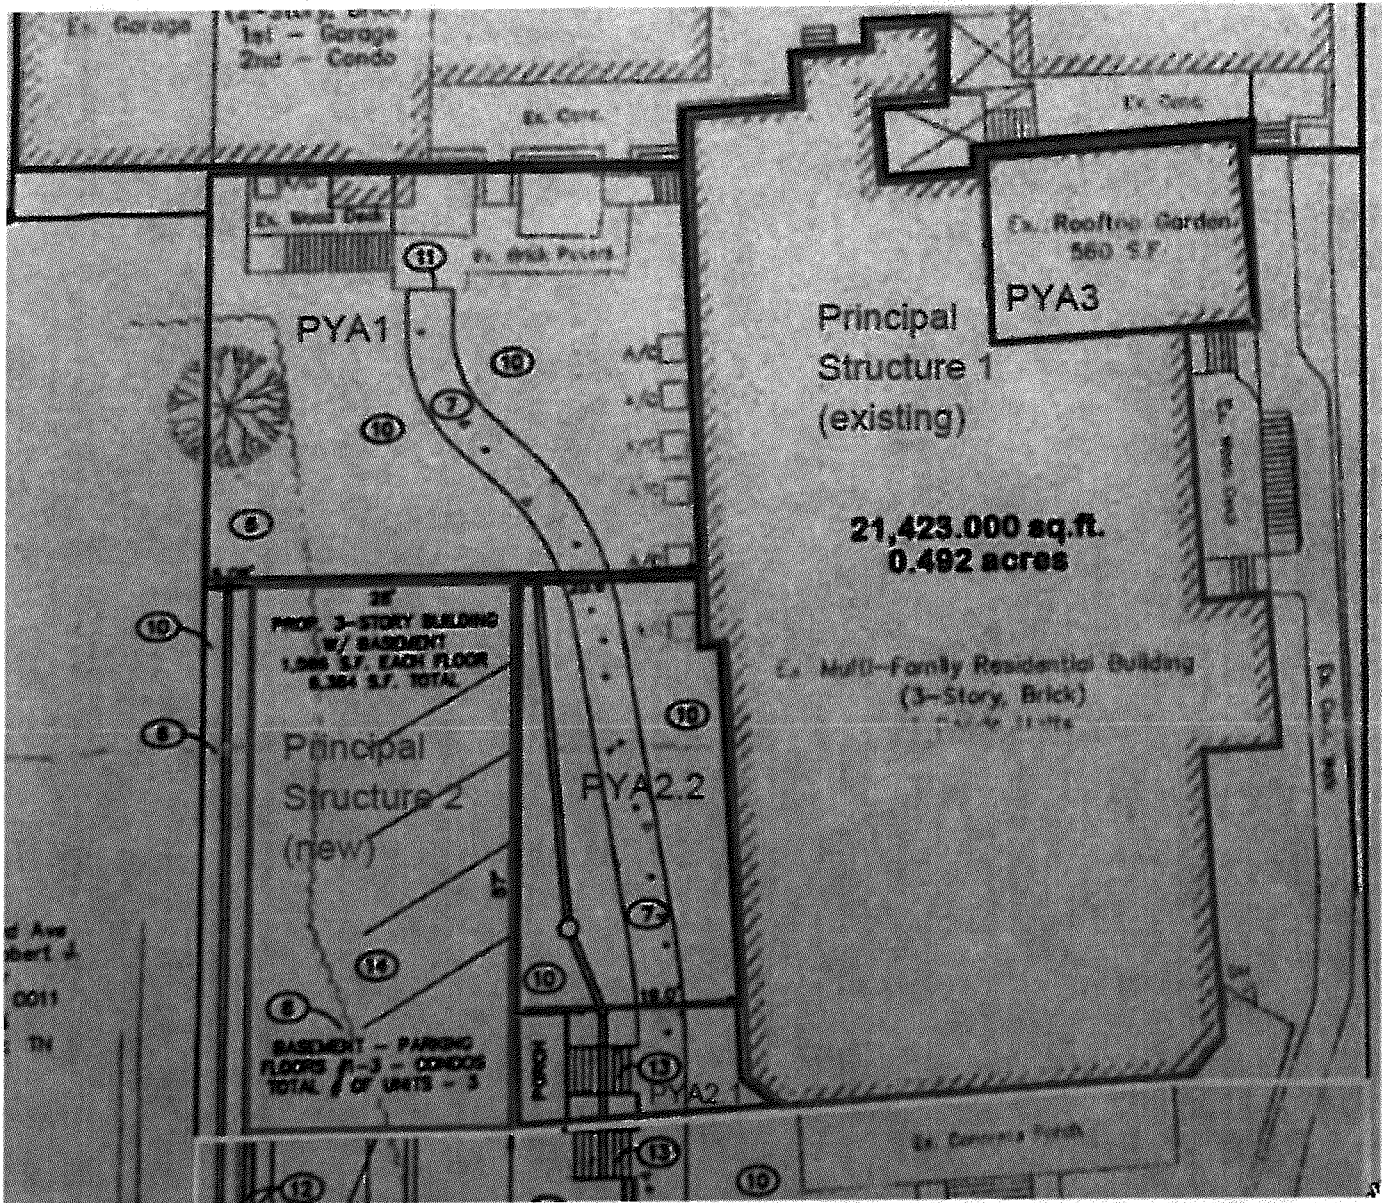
(Based on excerpt of 2013 building permit application document C3 – Site Layout Plan)
